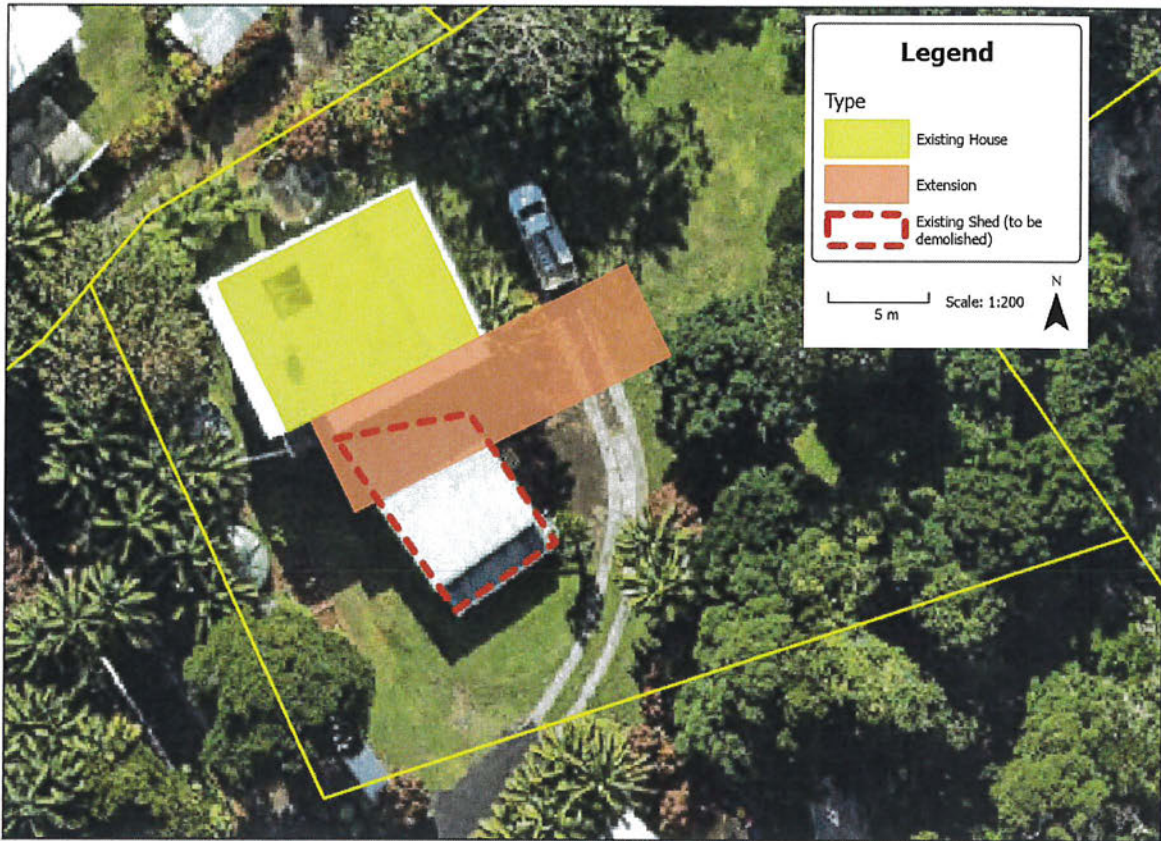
Location of proposed building footprint in relation to existing built structures on the lot.
